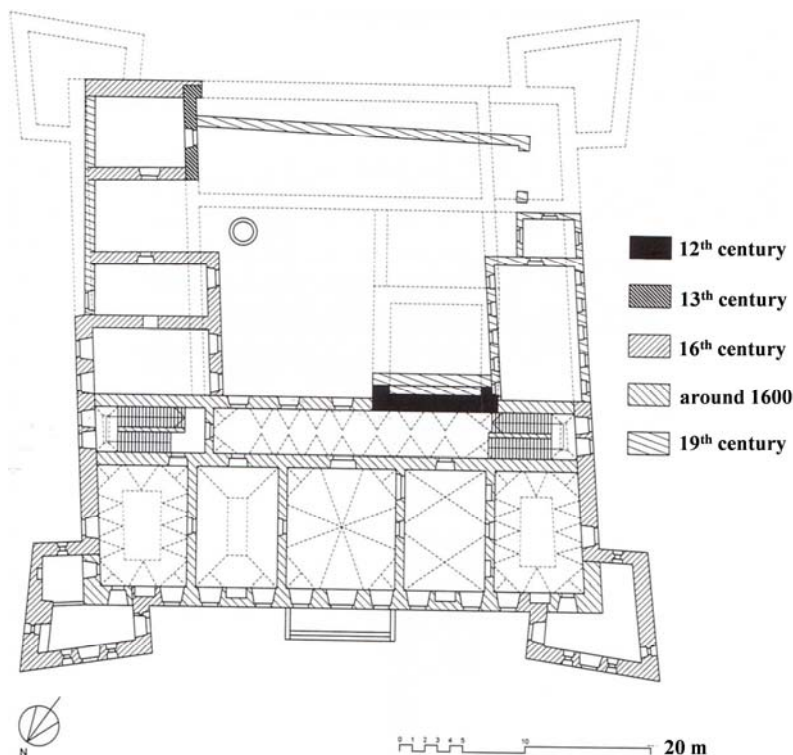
Ground floor plan of the mansion with marked construction phases [269]
